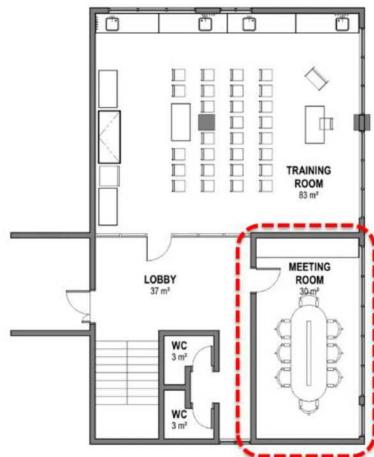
Option 3b – Flexible Training Centre w/Meeting Room
